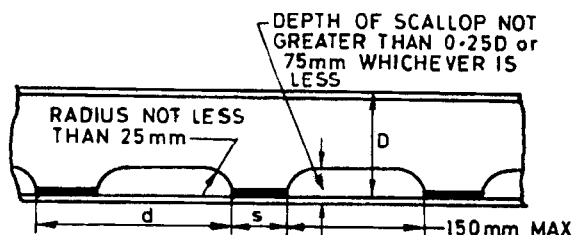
DETAILS OF SCALLOPED CONSTRUCTION
